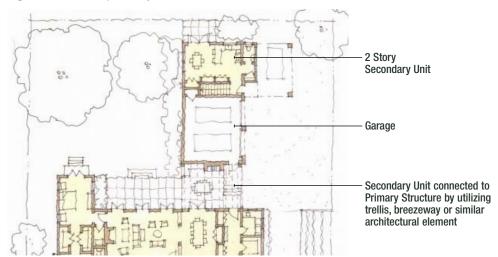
Conceptual Secondary Unit Plan Sketch
